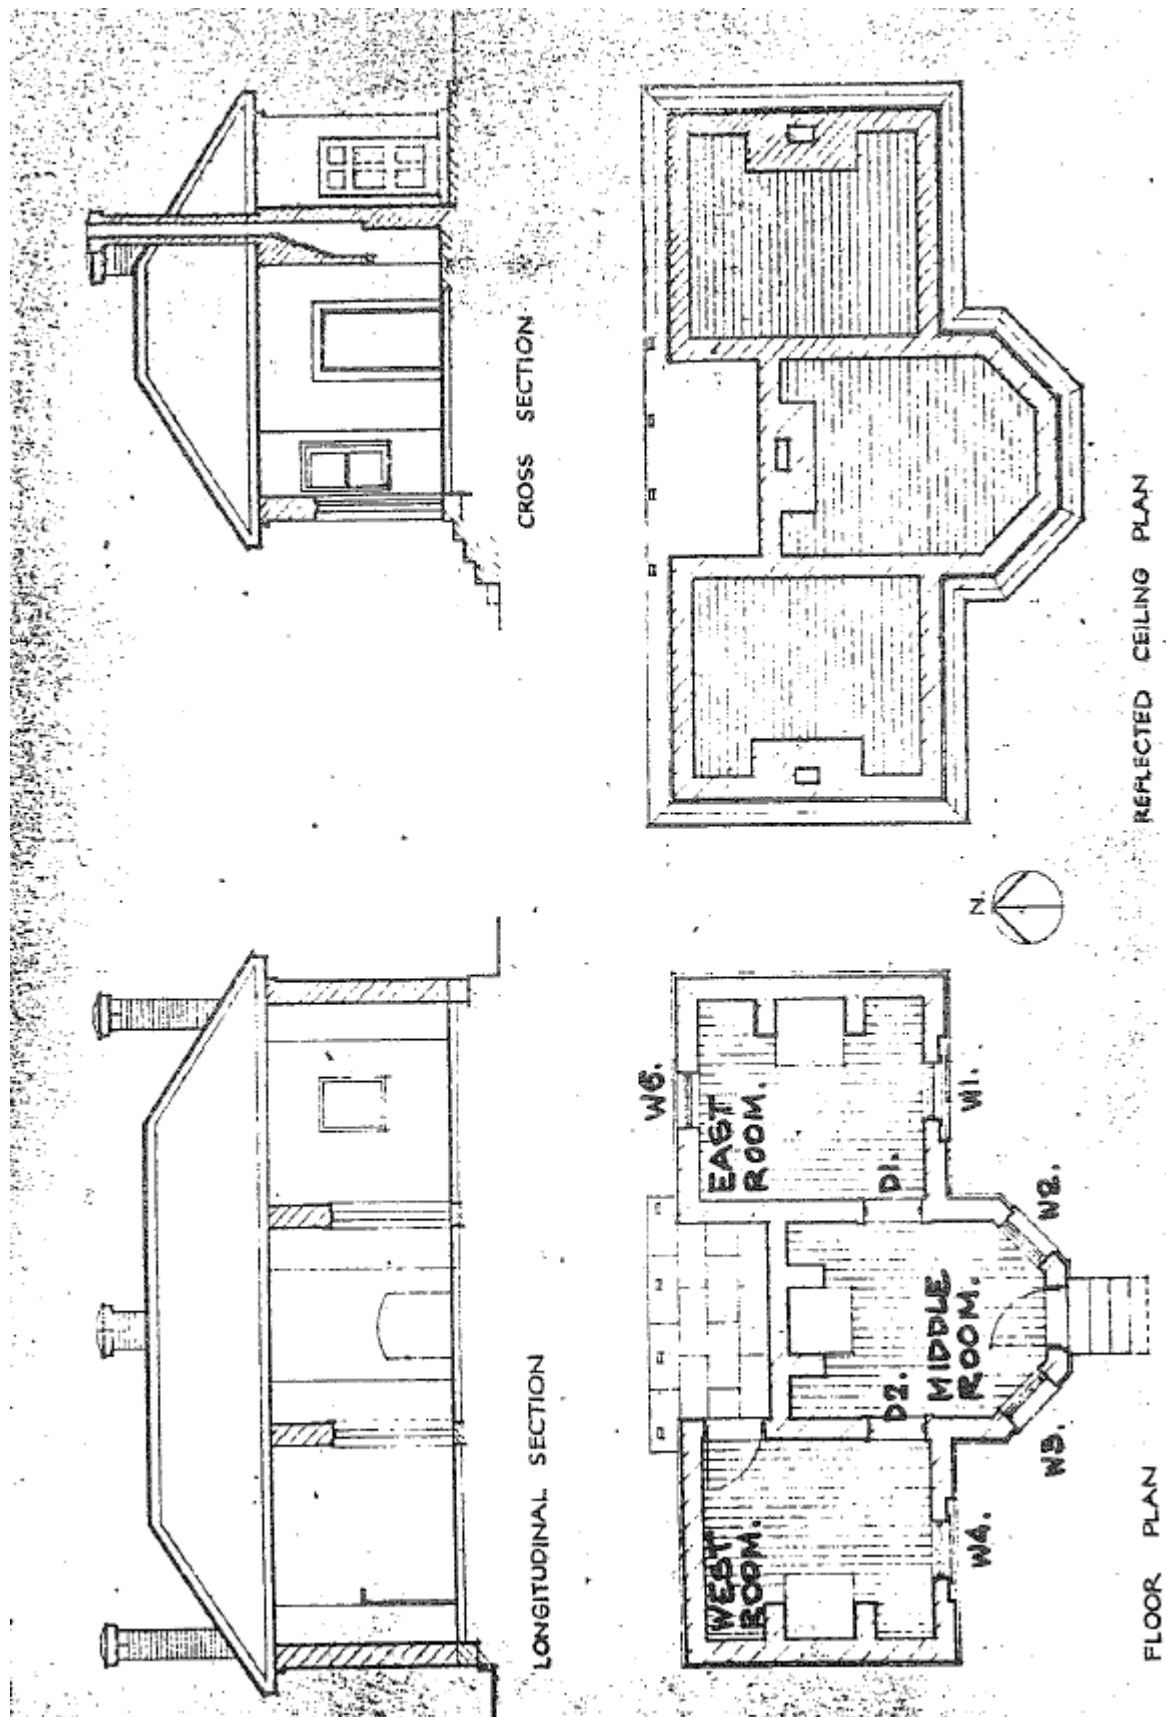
Drawings from 1997 showing elevations, floor plan, and reflected ceiling plan of the toll house (source: Hawkesbury City Council)
